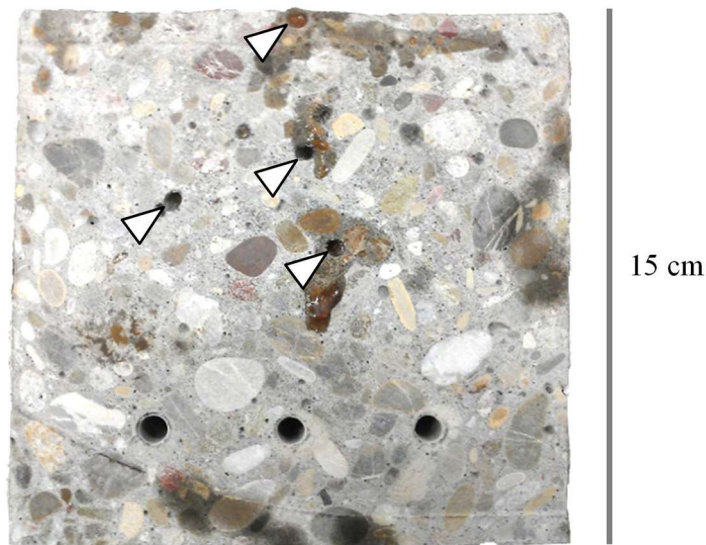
Cut cross section of concrete beam; arrows show capsules intersected.
